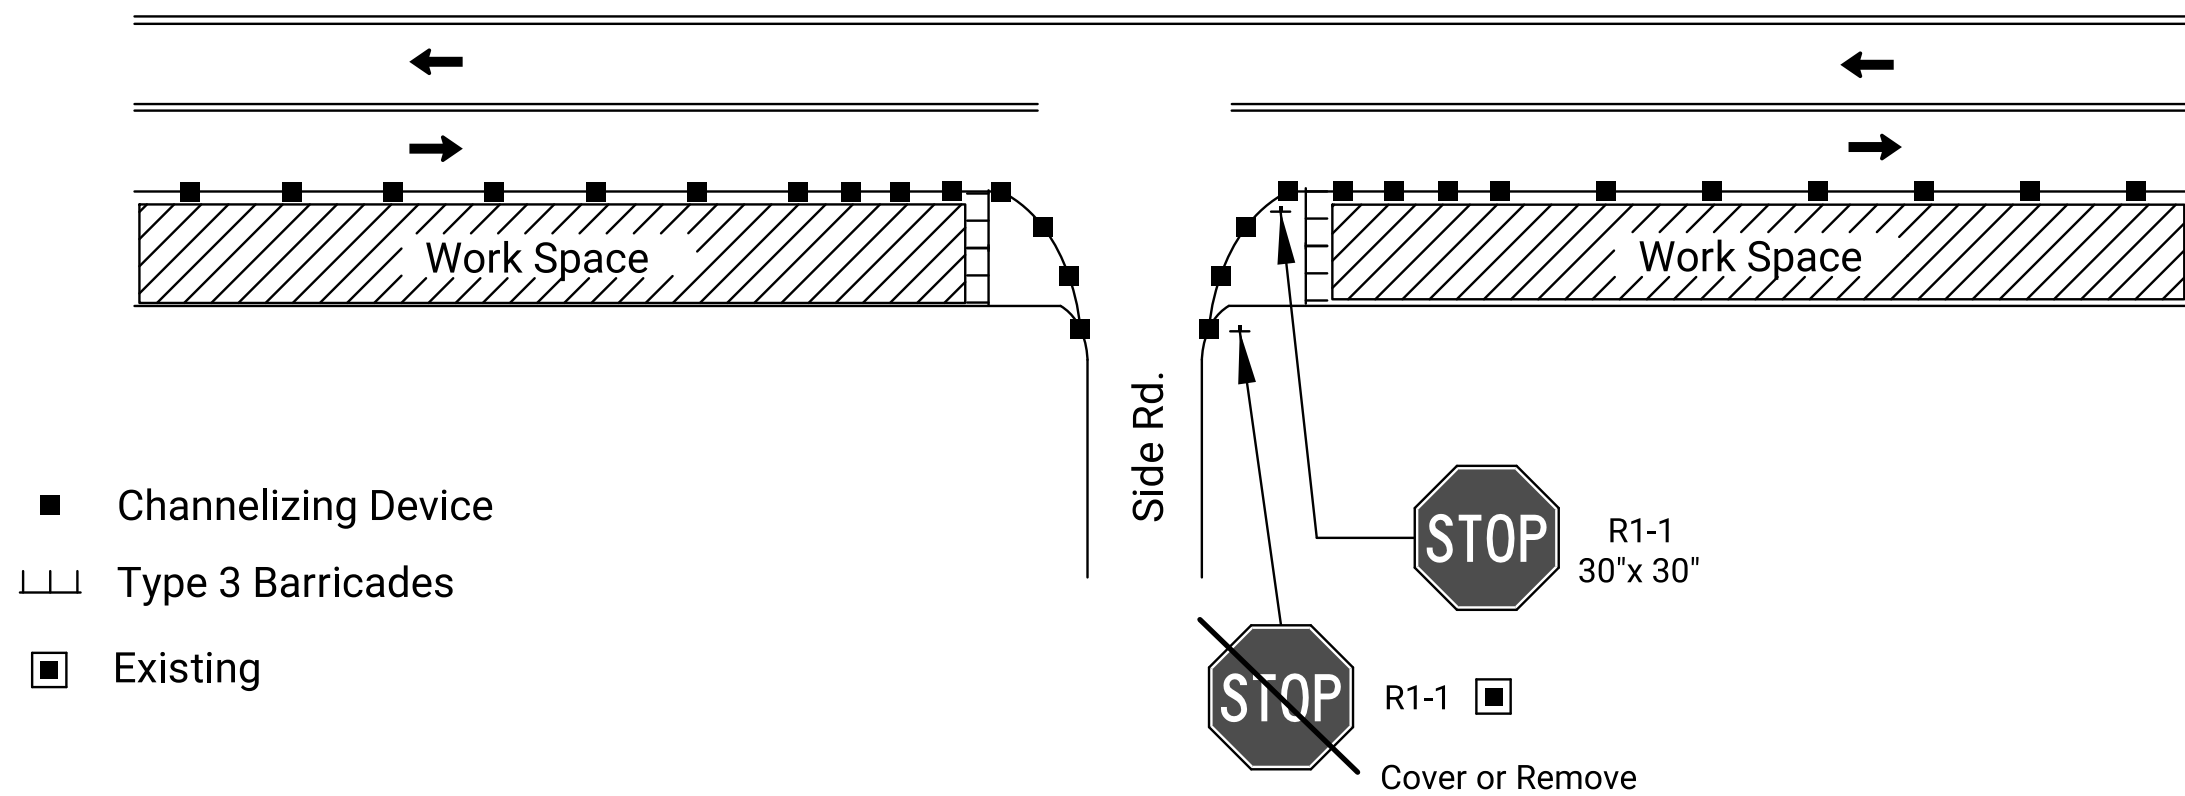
SIDE ROAD OR ENTRANCE OPEN THROUGH WORK AREA
